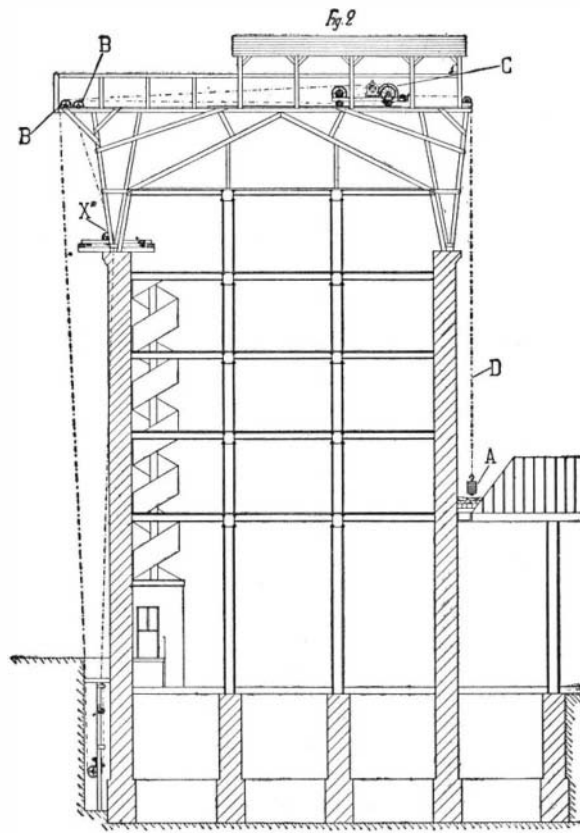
Diagram of Building, Showing the Cable Arranged for Sawing the Façade.
